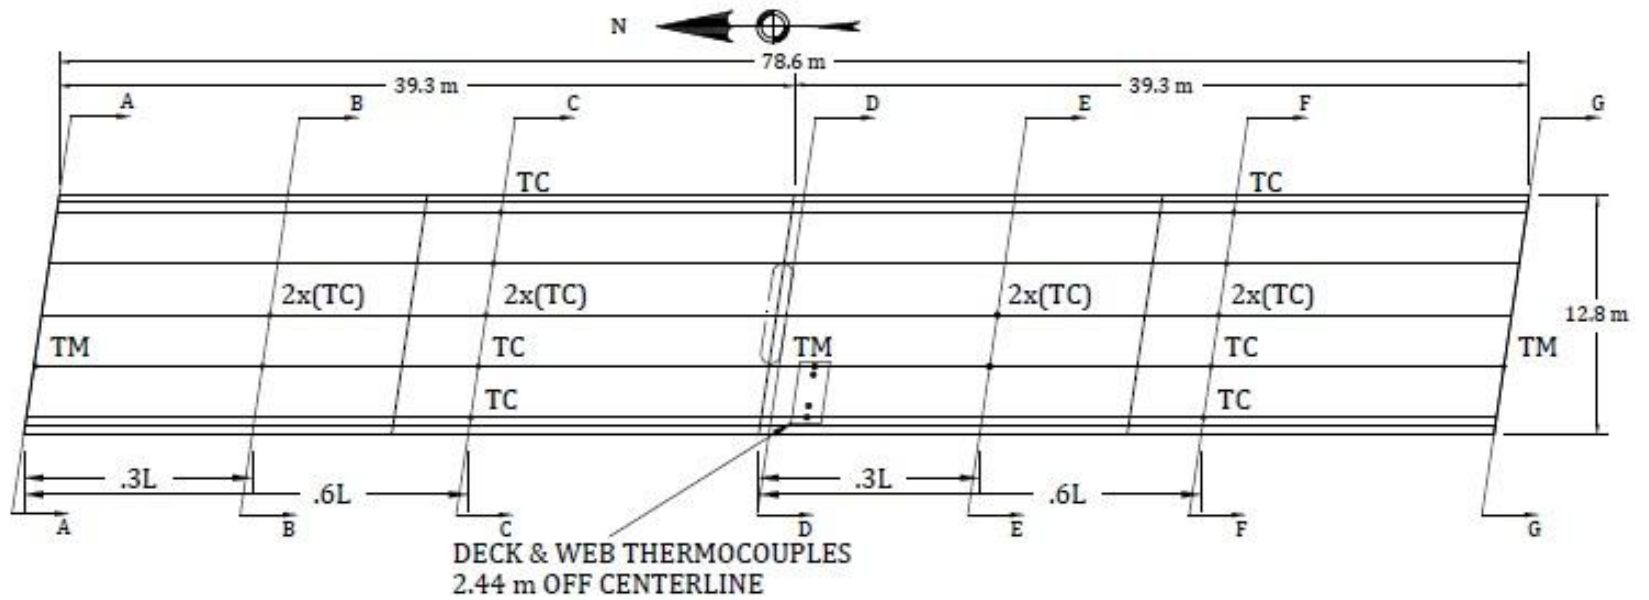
Plan view of the California Bridge with Thermocouples and Tilt-meters located.
